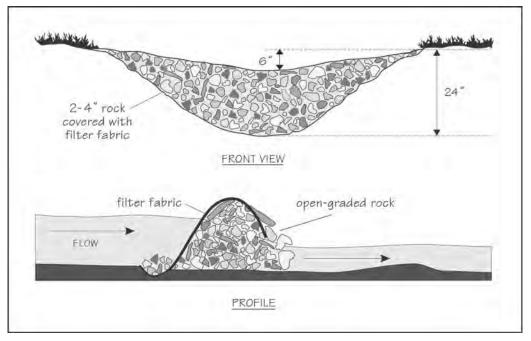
Rock Check Dam Detail (Modified from Washington State Department of Natural Resources, 1997.)
